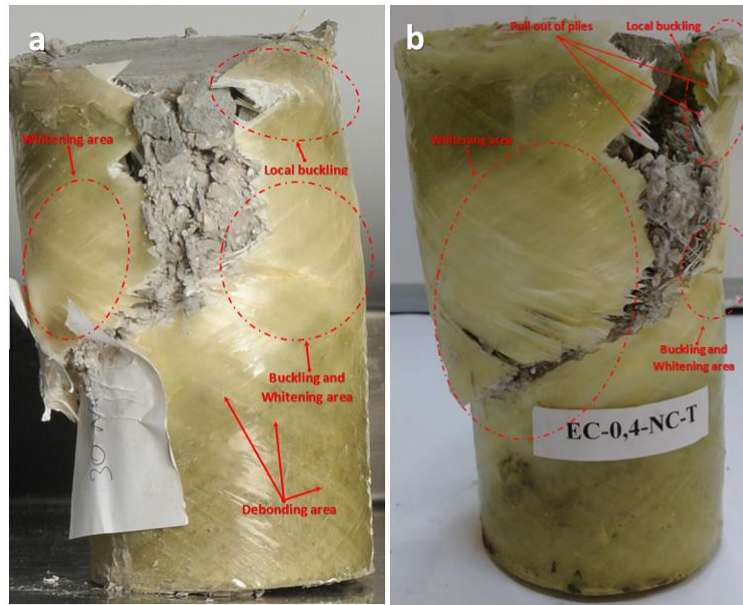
Local buckling causing intensive whitening and the contacting zone led the final failure of the pipe a) specimen NC-0,5-NC-T b) specimen EC-0,4-NC-T
